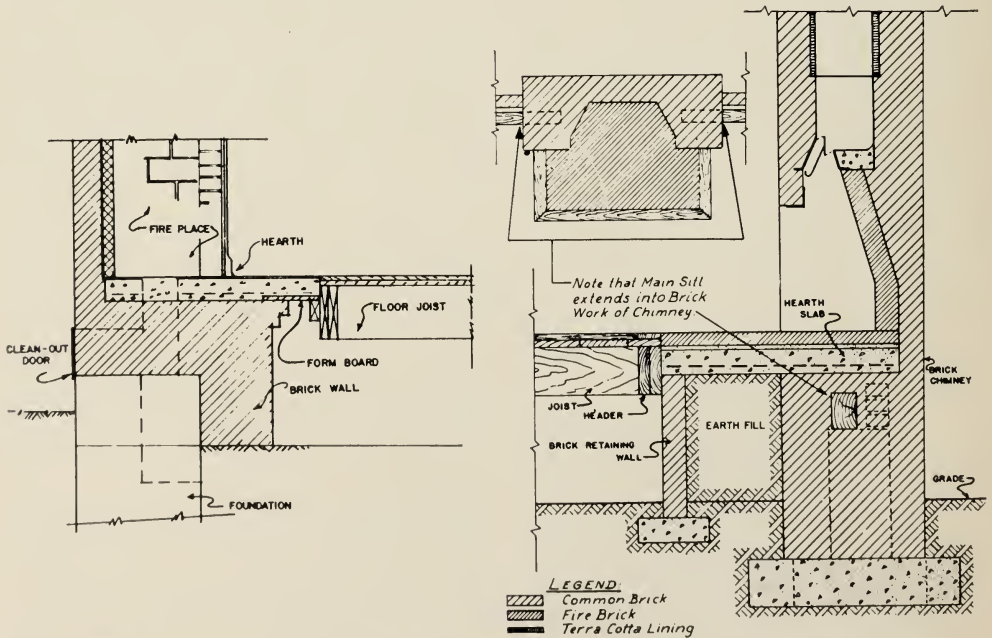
Types of construction. Left, fireplace of unexcavated house; right, earth-filled fireplace of unexcavated house. (From Heal, 1951.)
